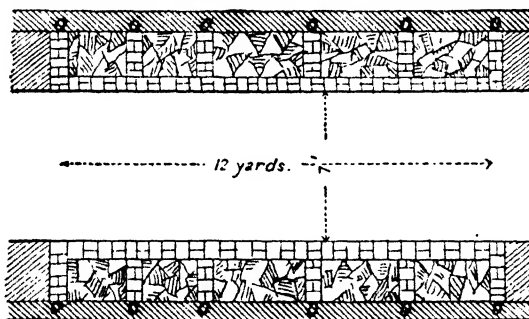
BRICK-ARCH AIR-CROSSING, IN PLAN.
